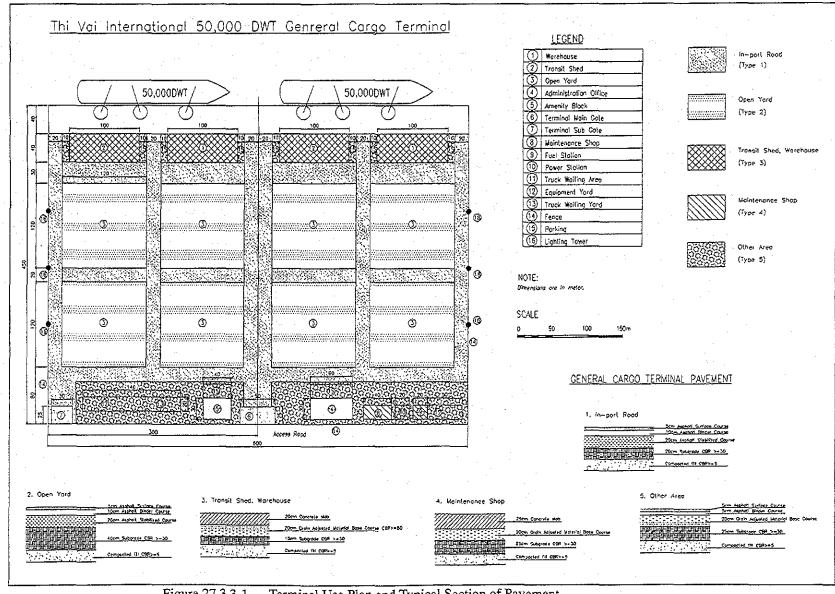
Terminal Use Plan and Typical Section of Pavement
